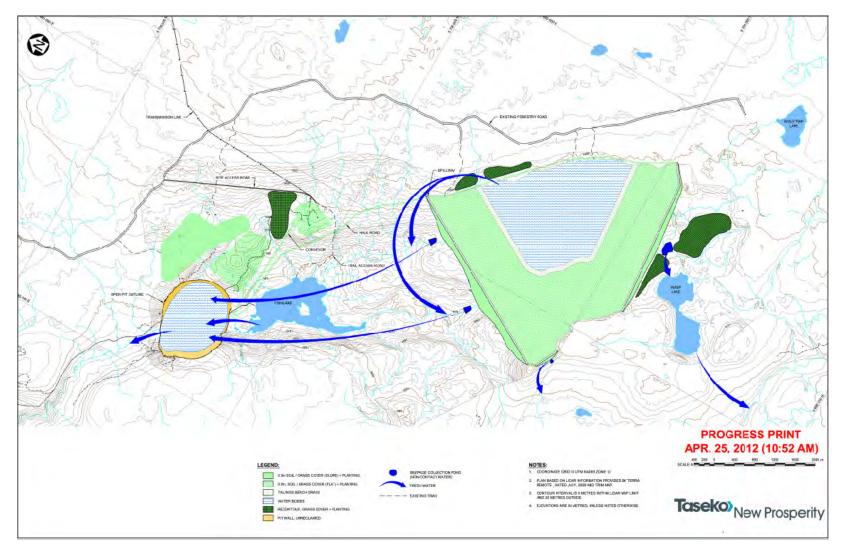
Water Management – Final Reclamation Plan
